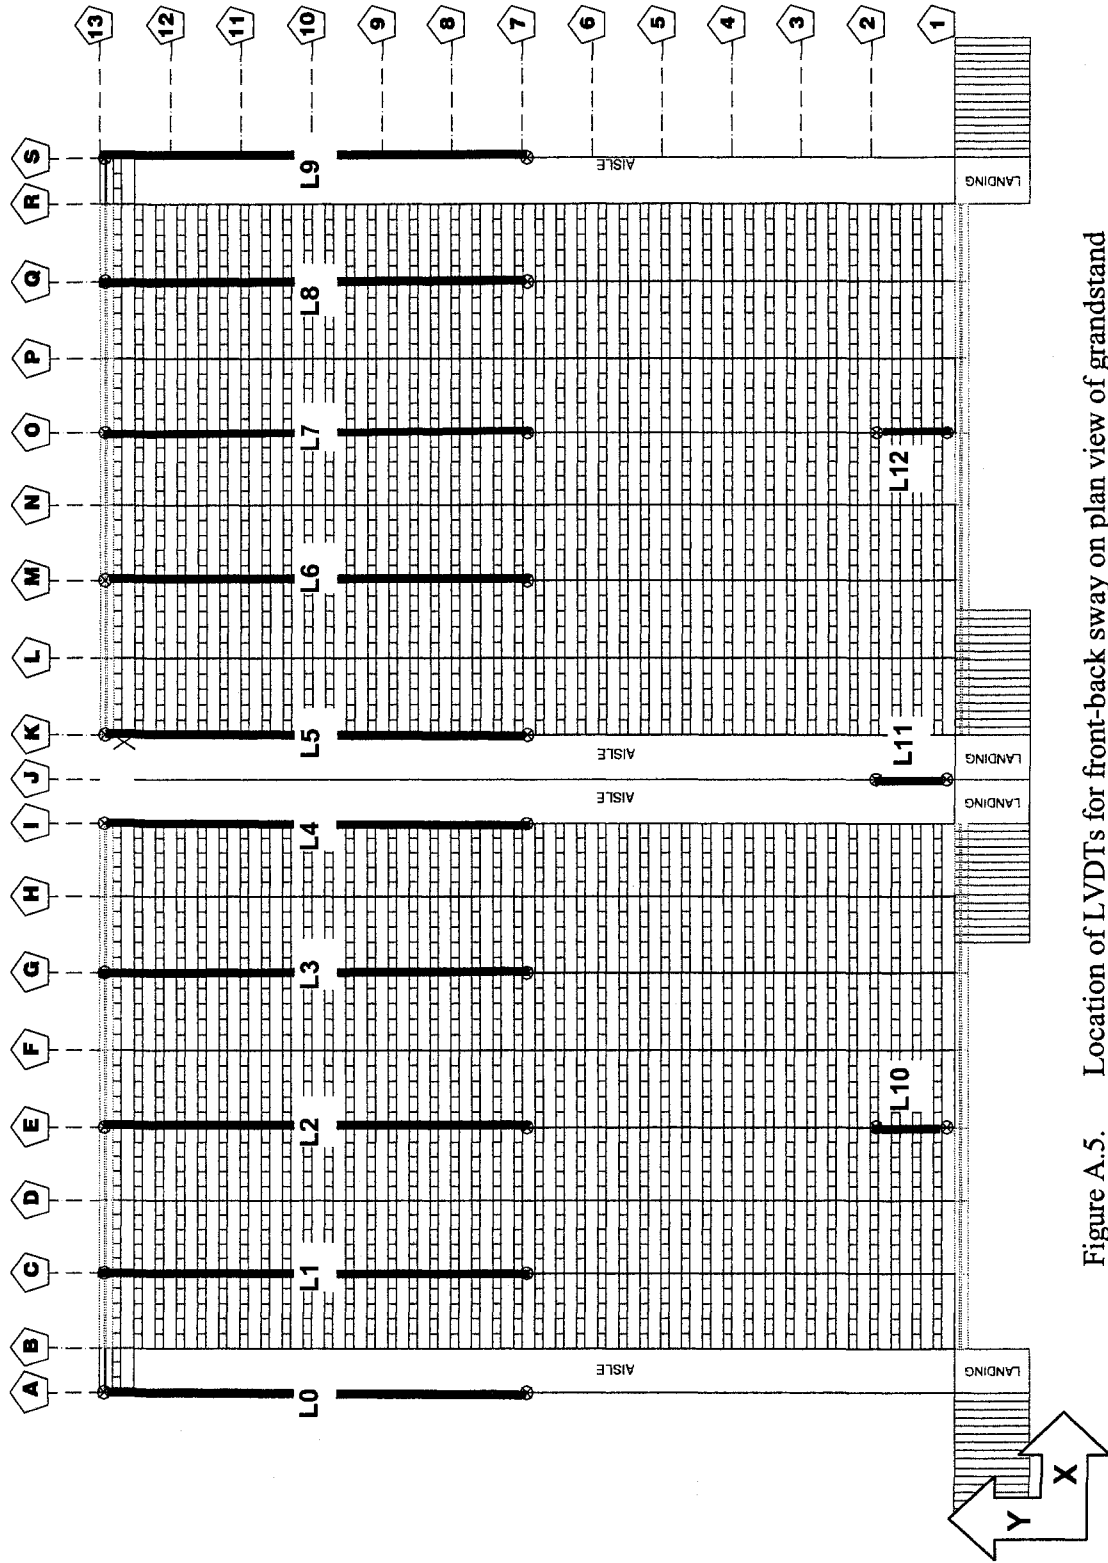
Location of LVDTs for front-back sway on plan view of grandstand
